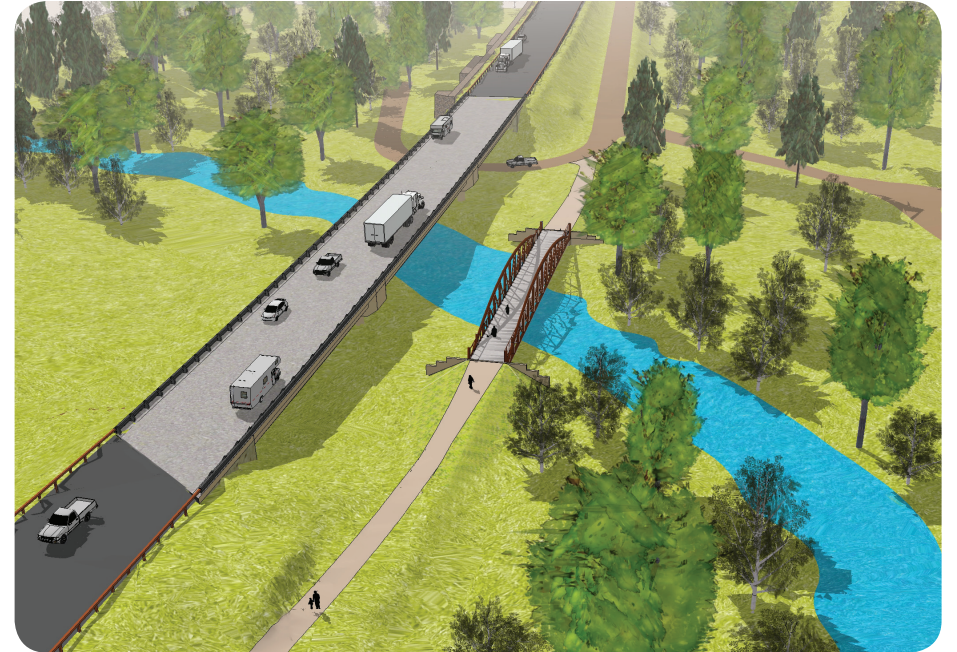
Bird's-eye view of safety path and pedestrian bridge looking south.
